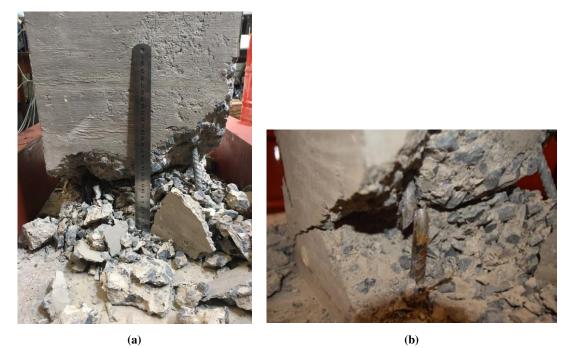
Resultant damage to the reinforced concrete footing with (a) outward buckling of the reinforcement and (b) reinforcement fracturing during the 0.78 g test
